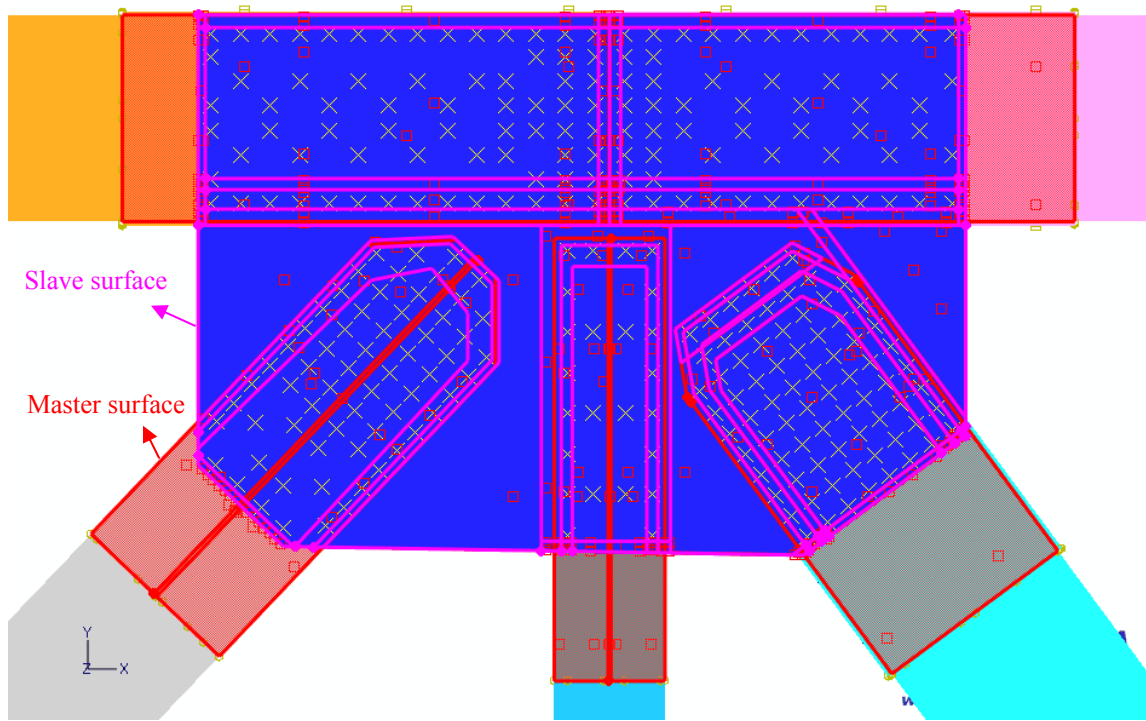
Contact pairs defined between gusset plates and five truss members at the U10W joint
